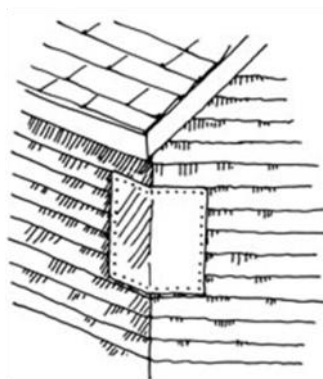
Opossums access to rooftops can be eliminated by installing sheets of aluminum flashing, at least 3 feet square, around the corners of buildings.
